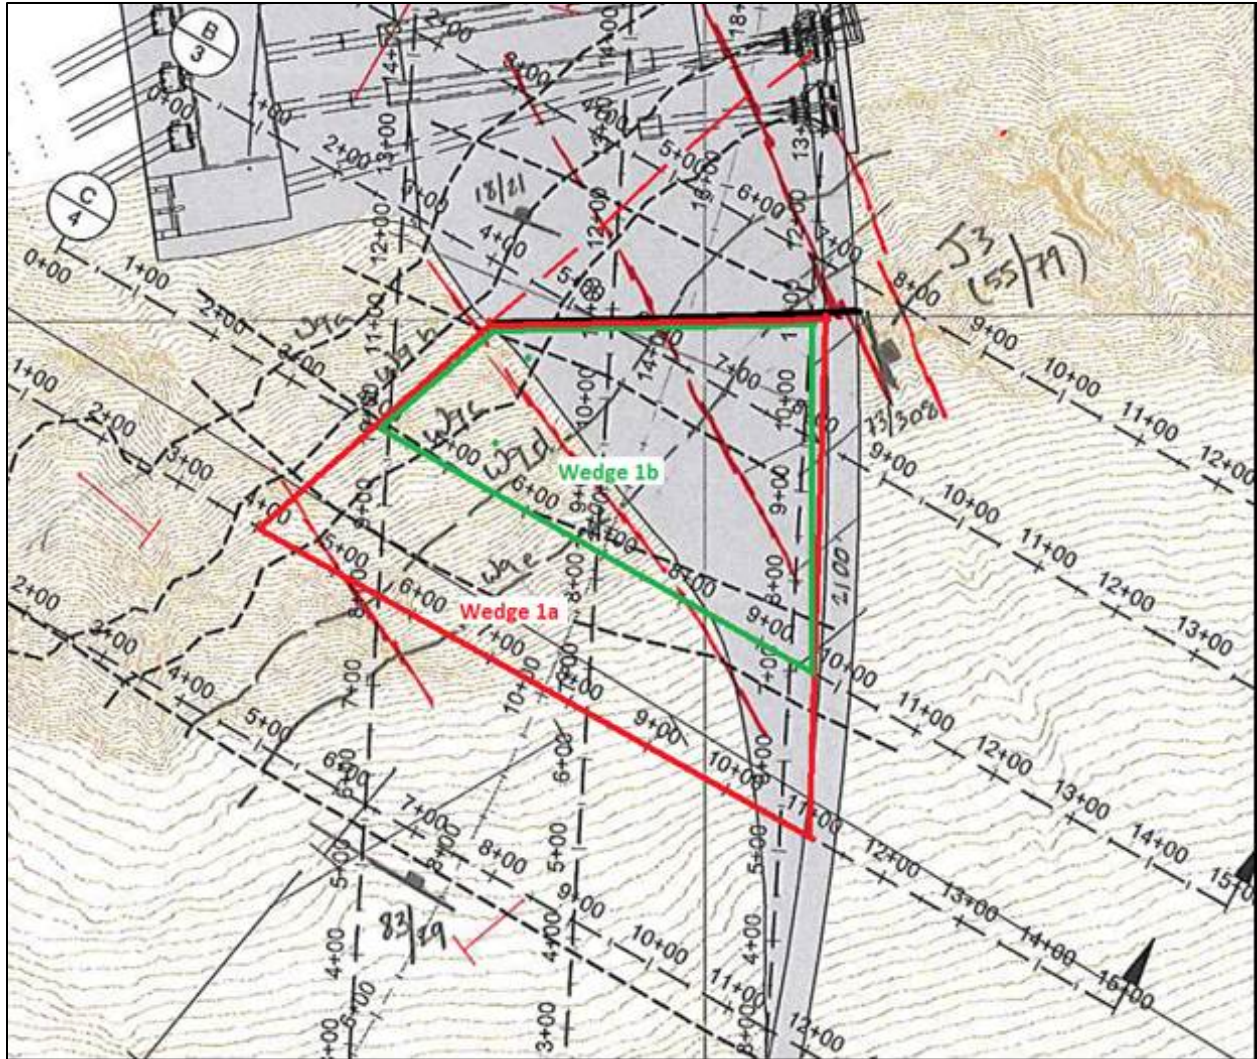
Plan, Left Abutment Wedges 1a and 1b
